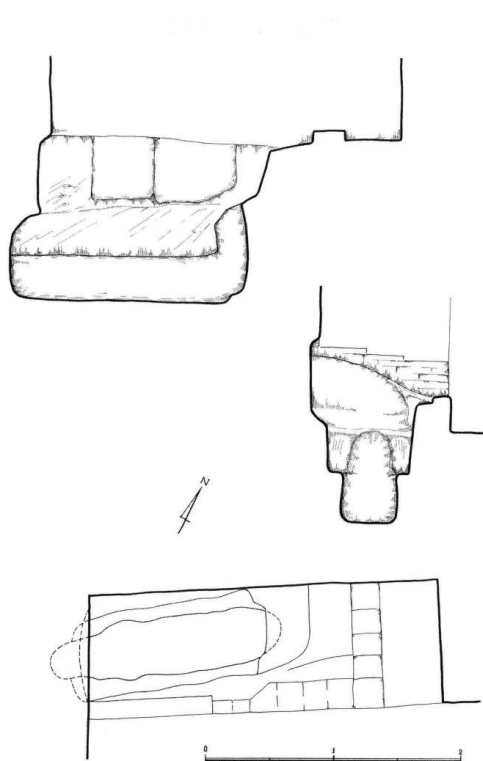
The tomb of St. David Garejeli. Plan and sections.
